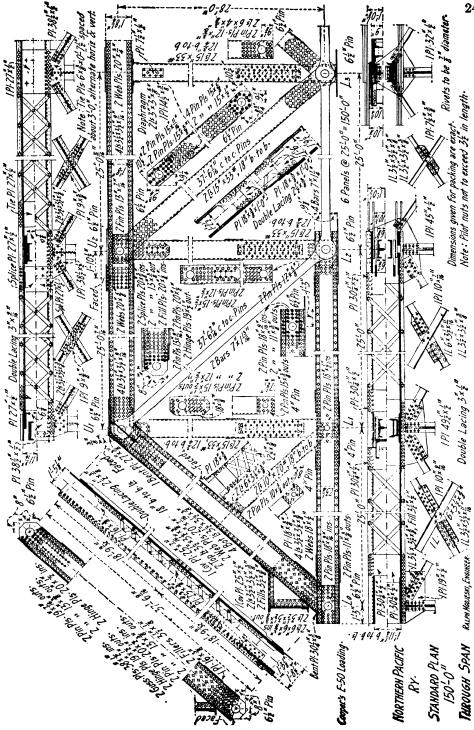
Single Track Through Pin-connected Railway Bridge.
